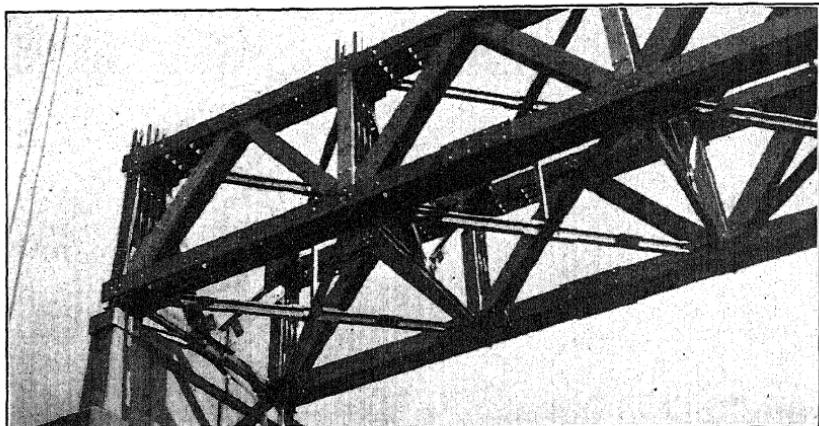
Close up view of Wolmanized Douglas fir trusses for Puget Island-Cathlamet, Washington, Bridge.
